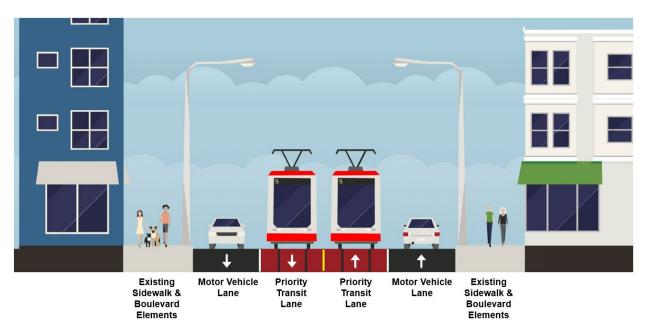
Typical Cross-Section, Bathurst Street South of Barton Avenue
